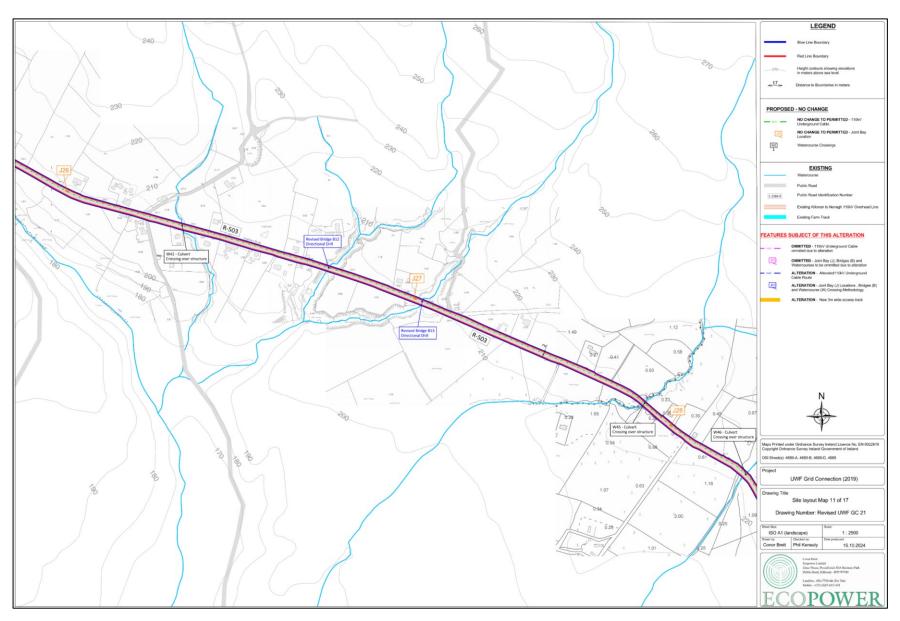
Proposed Alterations (B12; B13) – site layout, 8 of 10 (EDL).
